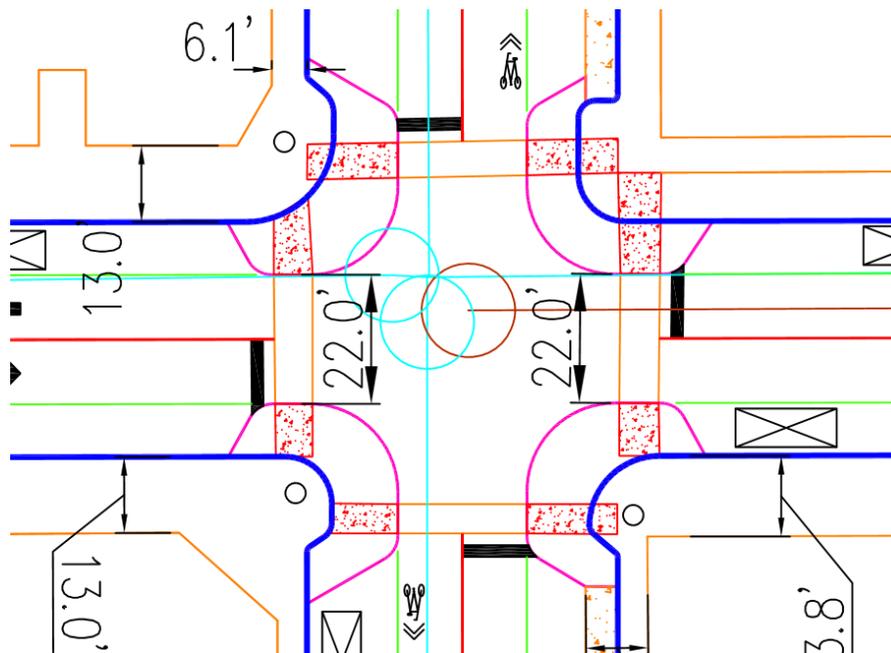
Plan drawing of the Pennsylvania Ave./E. State St. intersection with incorporation of the new pedestrian bump-outs. 11 foot lane widths are maintained throughout the intersection.
